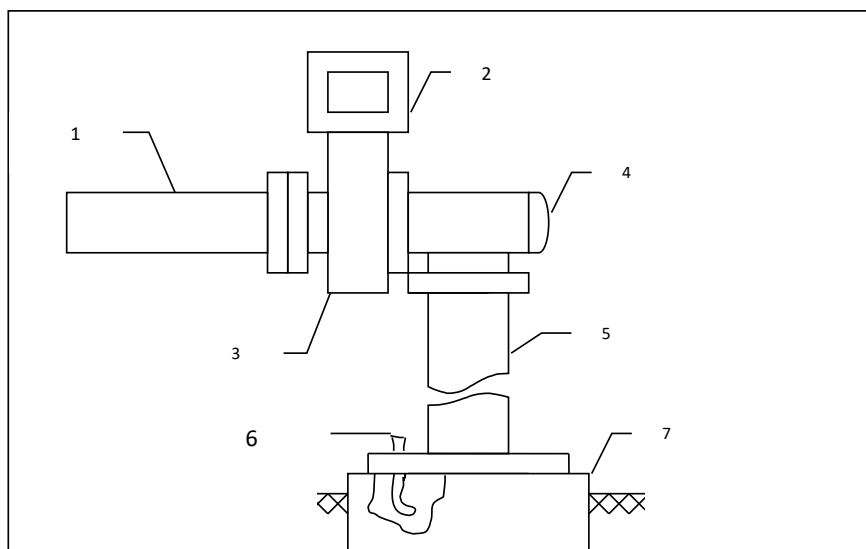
Schematic diagram of aspiration installation: 1 - filter holder; 2 - air outlet; 3,4 - fan with electric motor; 5 - support for electric motor; 6 - anchor bolt; 7 - concrete base.
